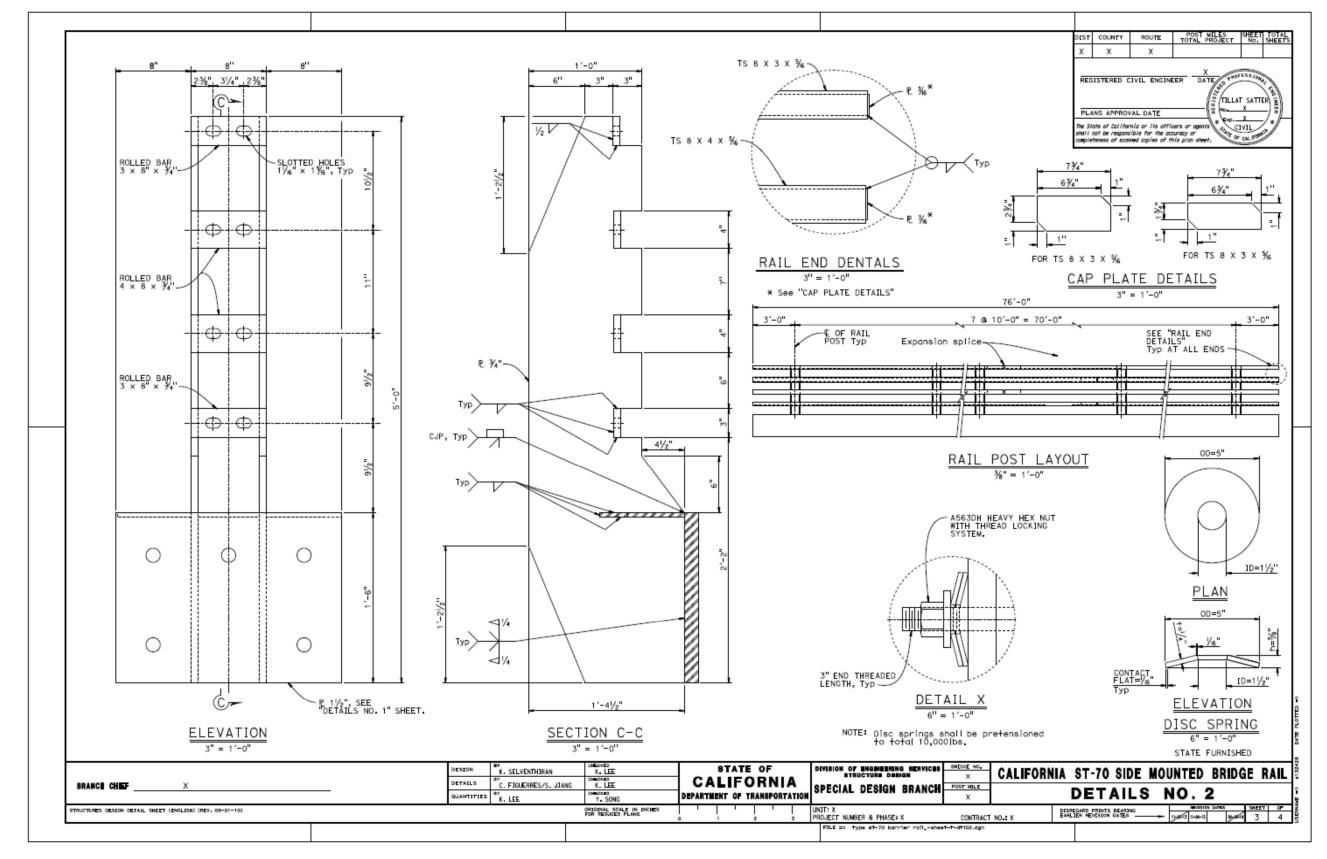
CA ST-70SM Side Mounted Bridge Rail (Details Page 2)
